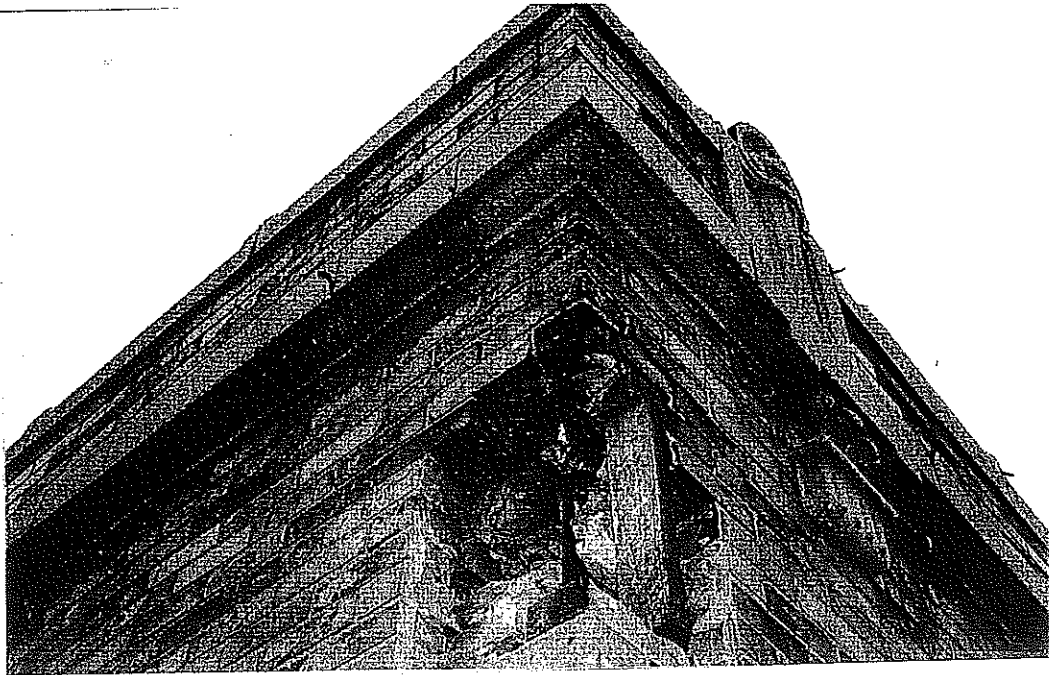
MOVEMENT AT TOP OF WALL AT SOUTHWEST CORNER.
